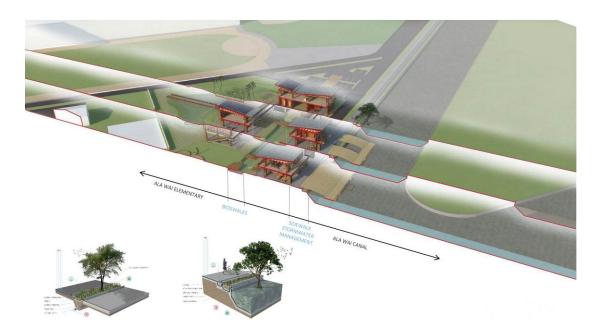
Section C-C | Cistern | Sidewalk Stormwater Management (Source: Author, Justin Manongdo)
